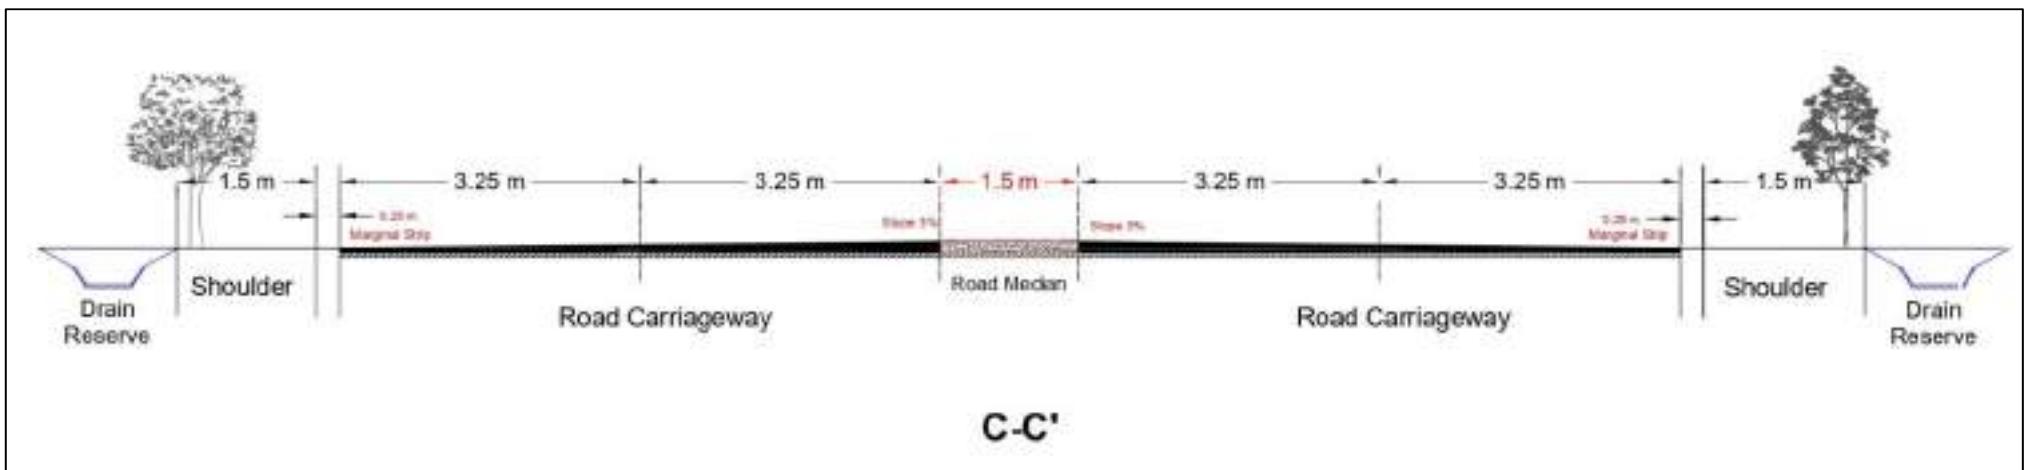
Cross Section of Major Road (Inside Study Zone A)
